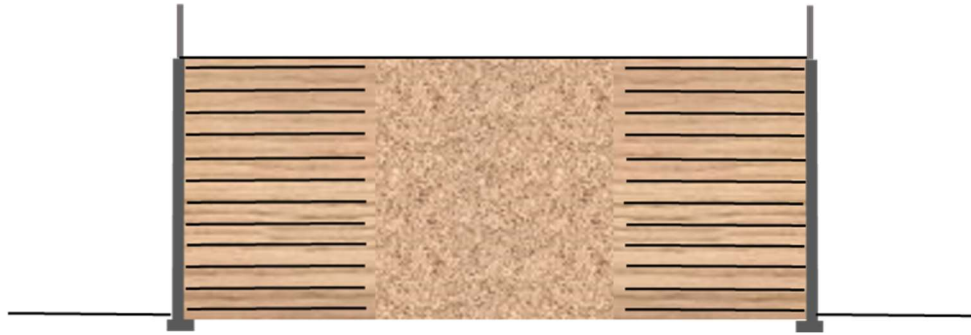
MSE wall bridge approaches and roadway embankments (Modified from Elias et. al (2001))
